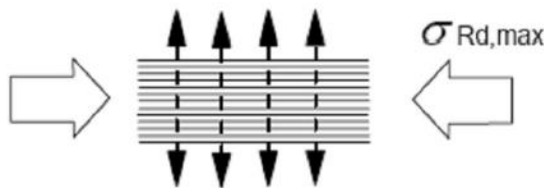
Design strength of concrete struts with transverse tension [5]
